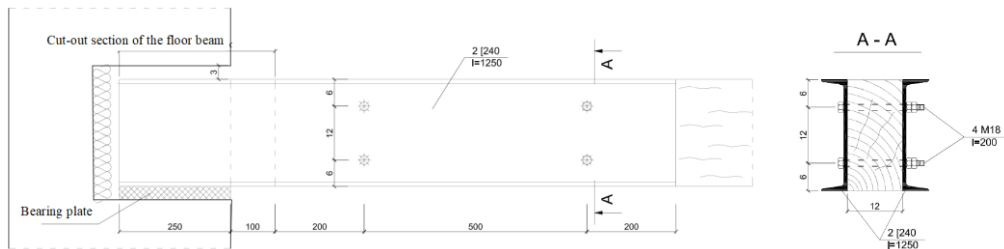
Method of strengthening the ceiling beam above the ground floor
